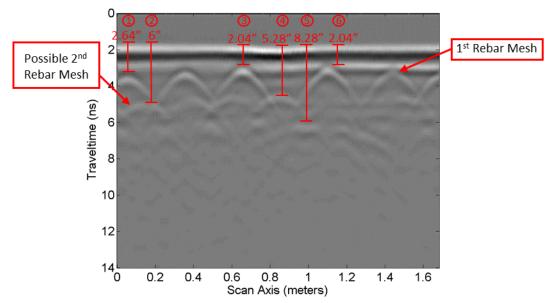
GPR Image (File 137), corresponds to a GPR scan on Area 2 on Bridge 77. Perpendicular to steel bridge deck girder.
